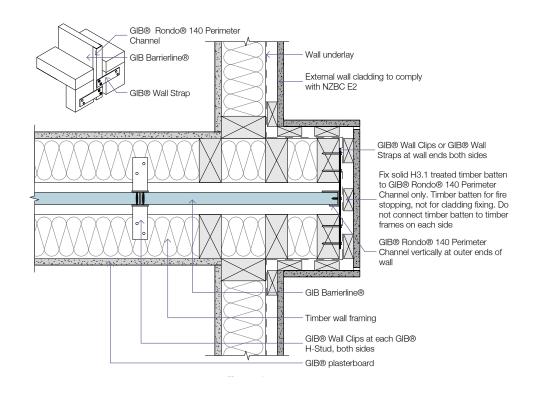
DETAIL AT EXTERNAL TIMBER FRAME WALL (PLAN VIEW)
